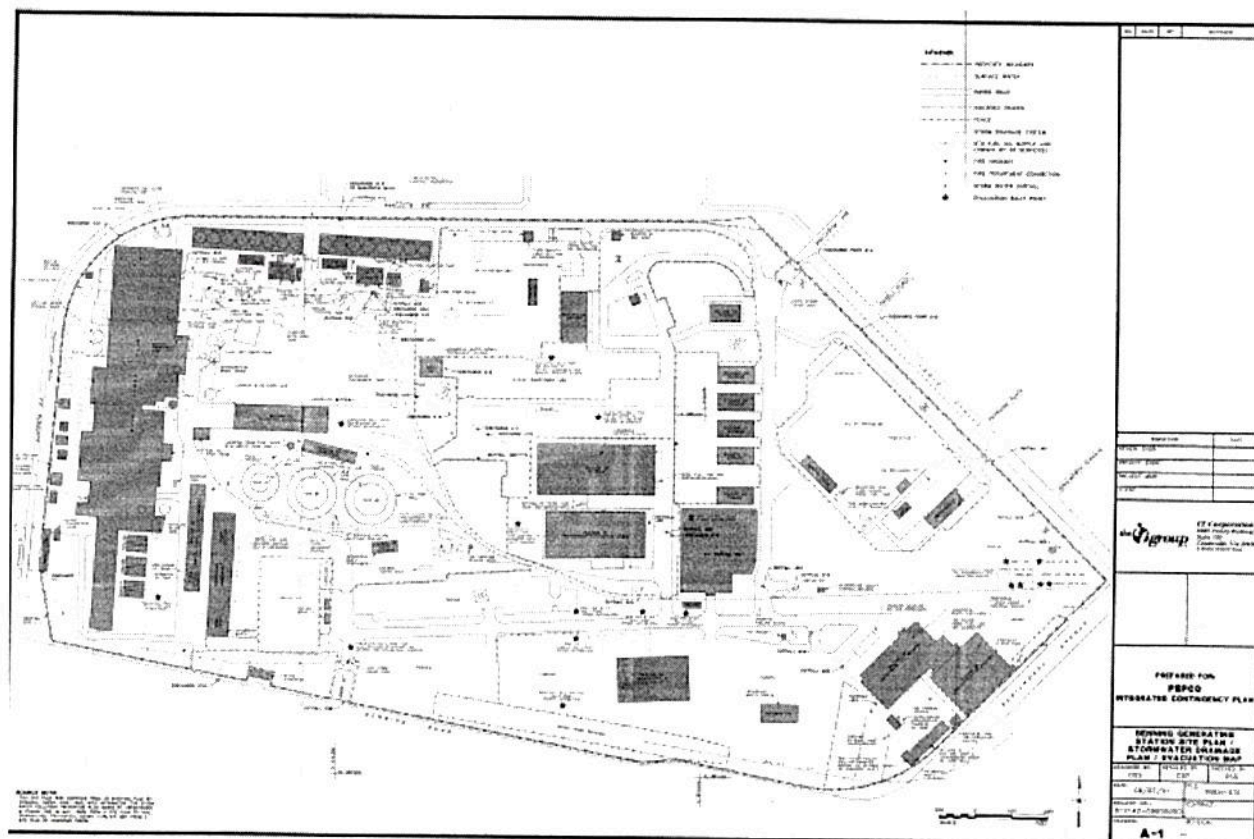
PEPCO Benning Generating Station – site plan and stormwater drainage plan.
